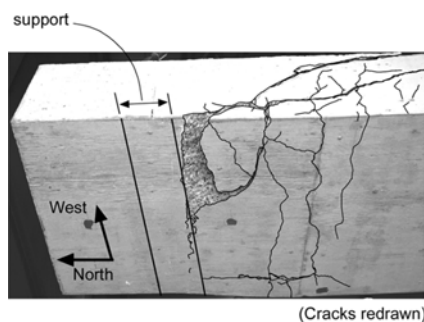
Soffit cracks for AX5 after failure.
